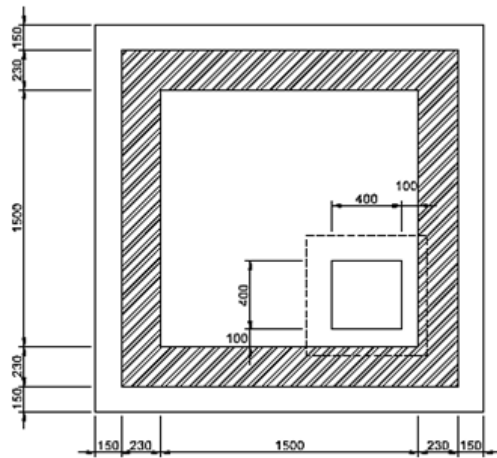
1500mm Manhole Dimensions (Bergstan)
